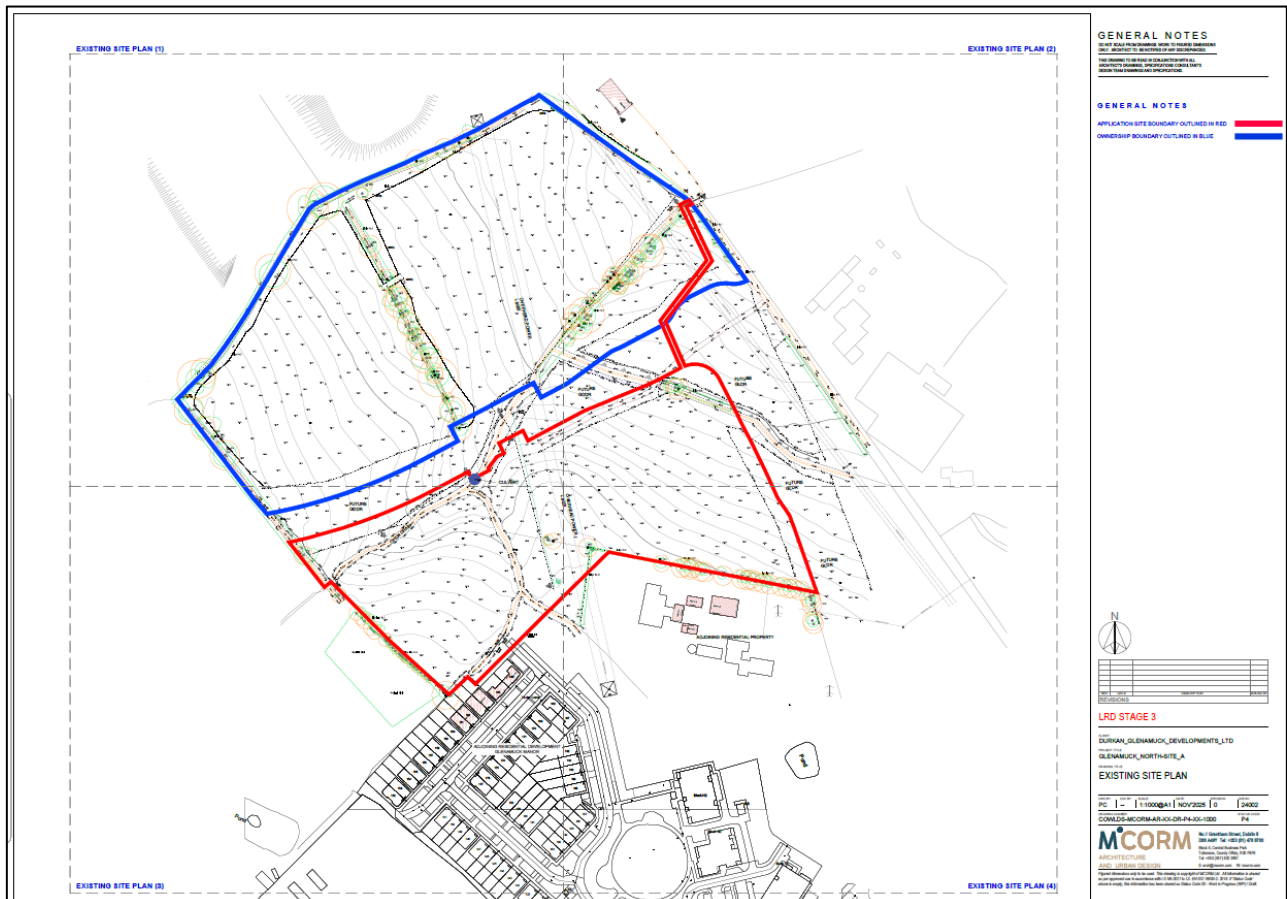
Existing Site Layout (MCORM, 2025; Drawing No. COWLDS-MCORM-AR-XX-DR-P4-XX-1000)
